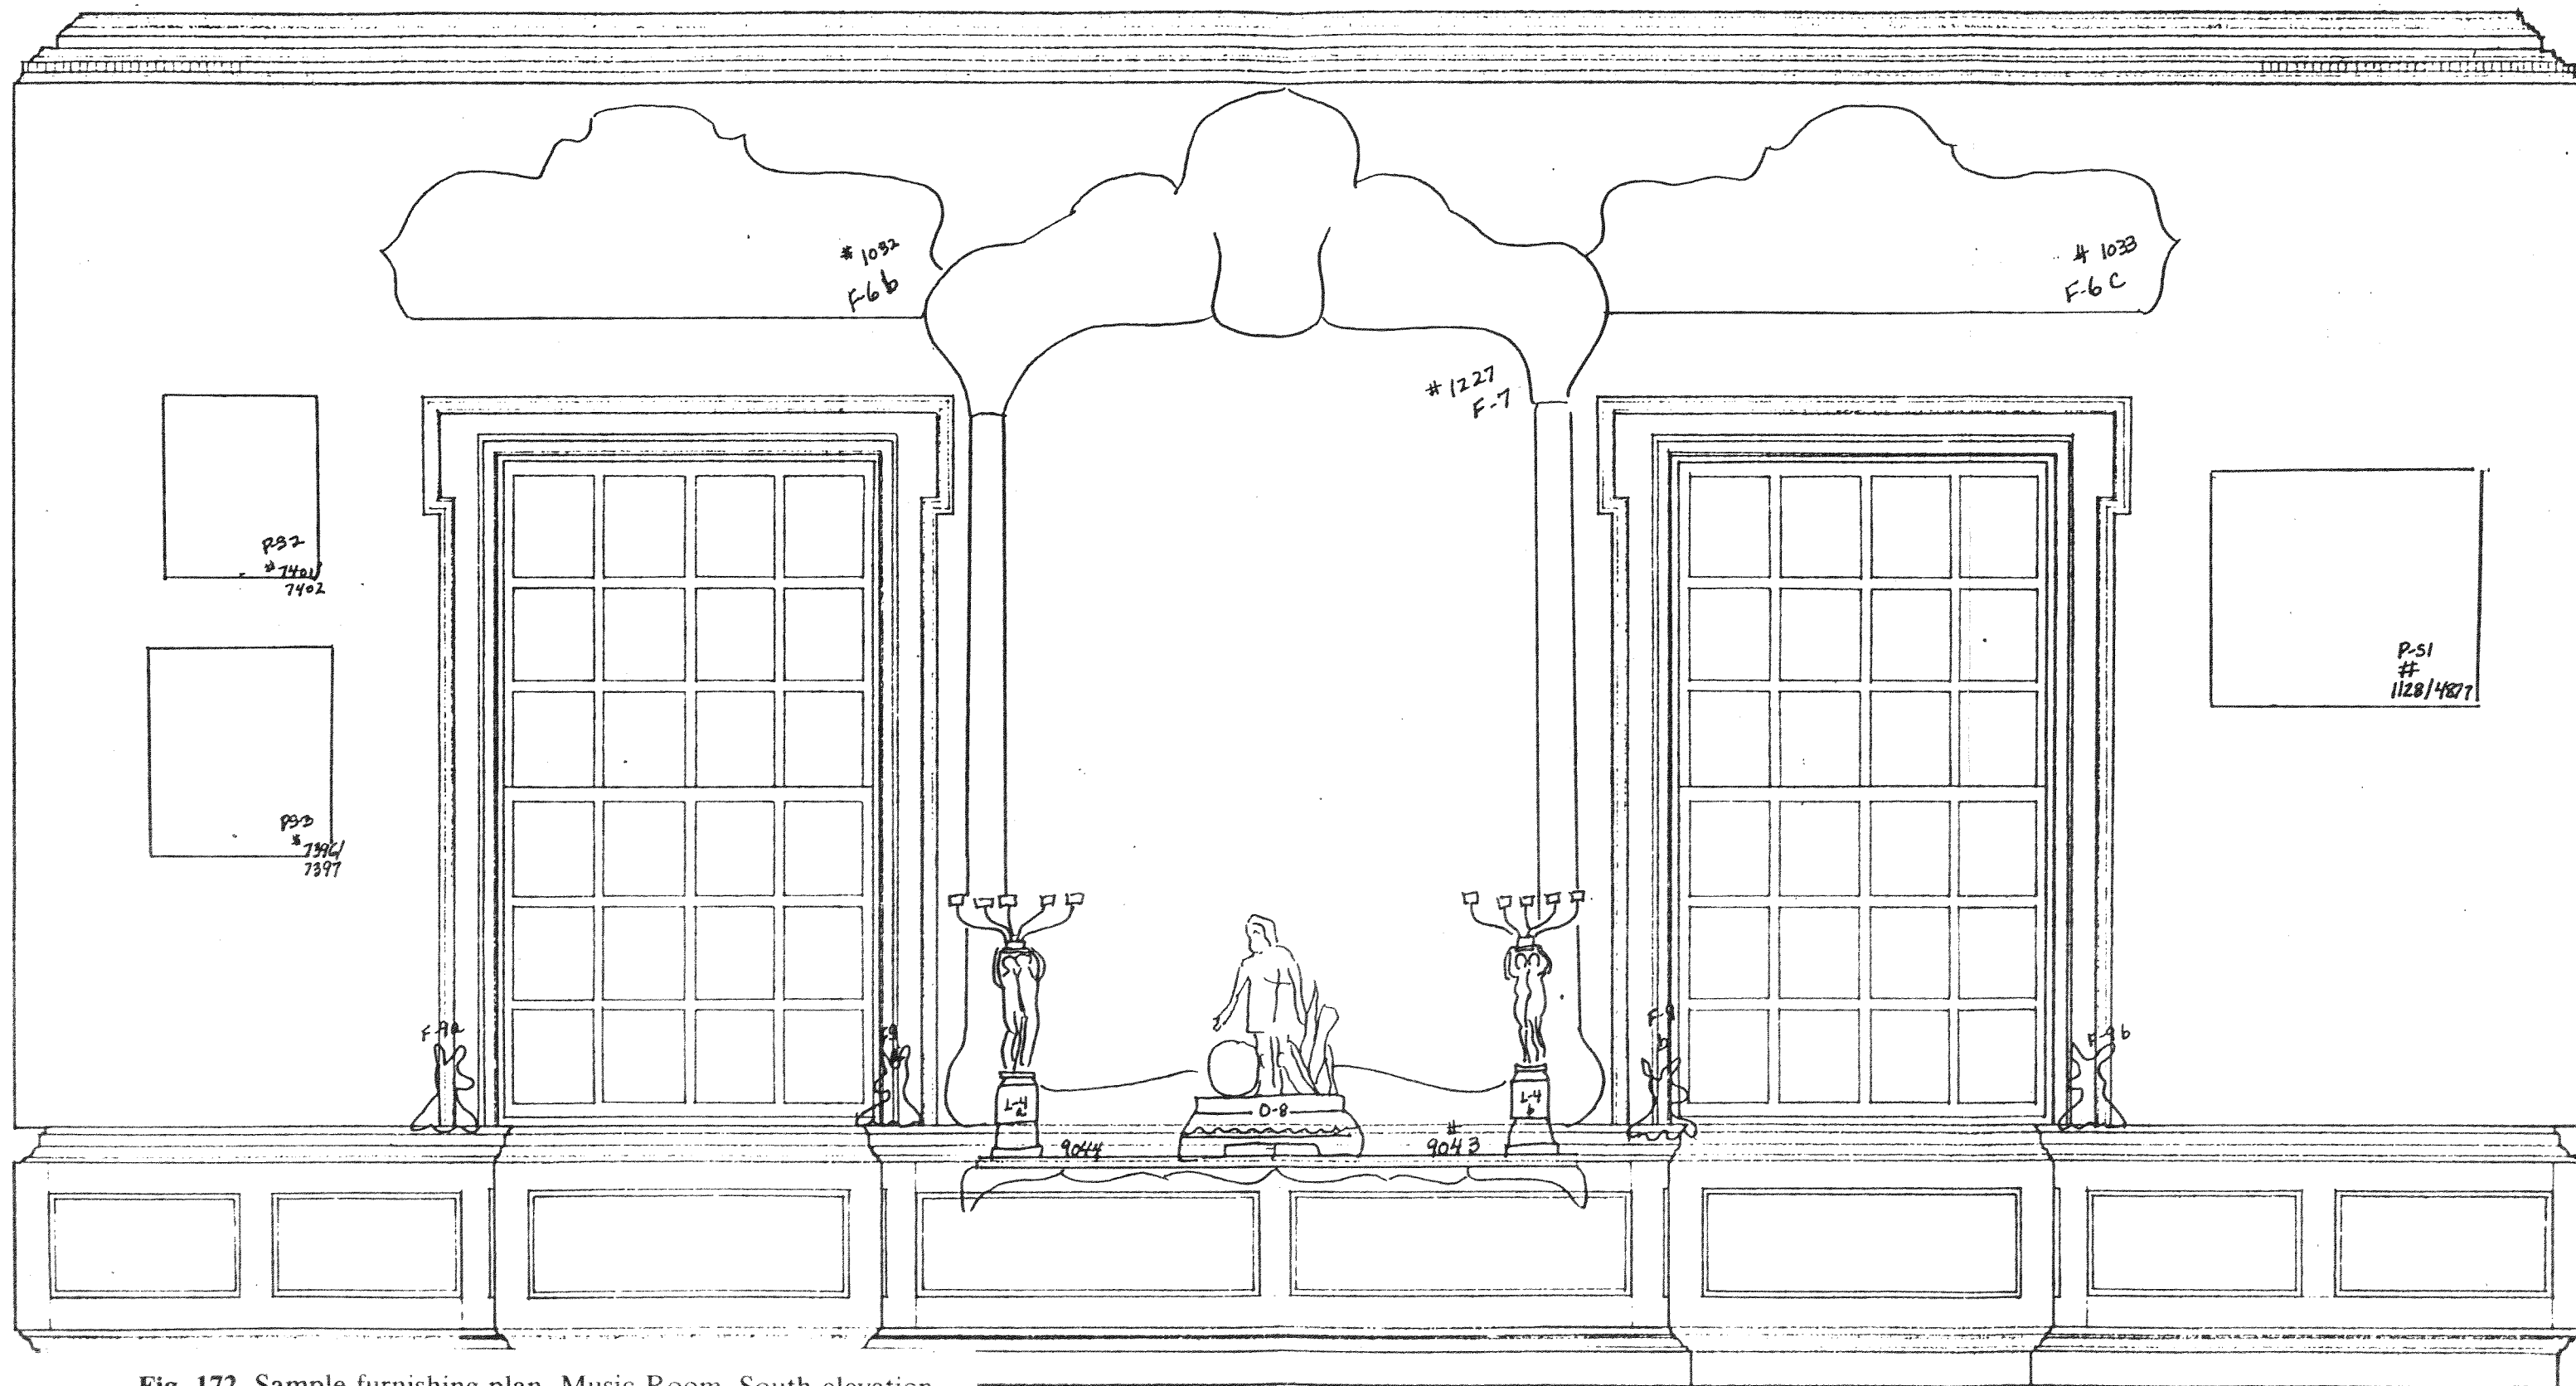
Sample furnishing plan, Music Room, South elevation.
